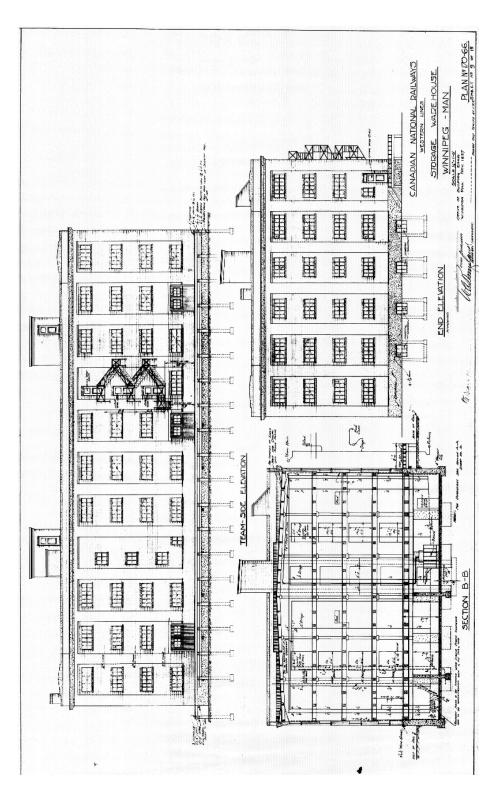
Plans: "Team-Side Elevation" [west], "Section B-B" and "End Elevation" [north], Canadian National Railways, Storage Warehouse, 1927. (<u>Historical Buildings and Resources Committee</u>.)
